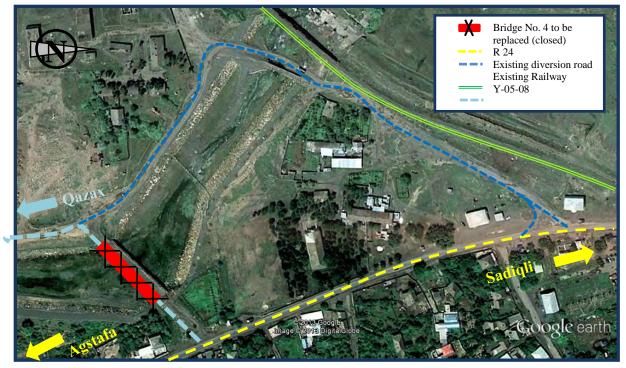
Bridge No. 4 Location Map with Reconstruction Alignment
